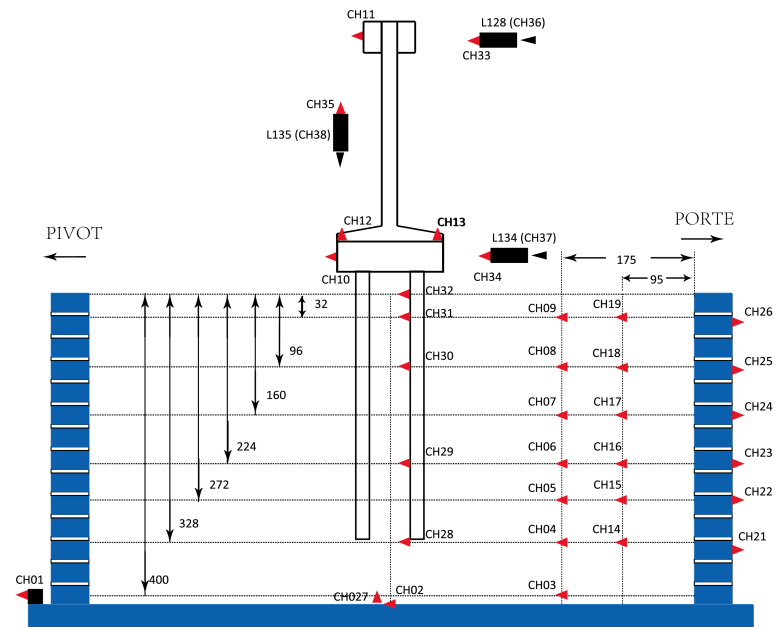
Sensors planning – vertical pile group with taller building, sine 3.5 Hz
